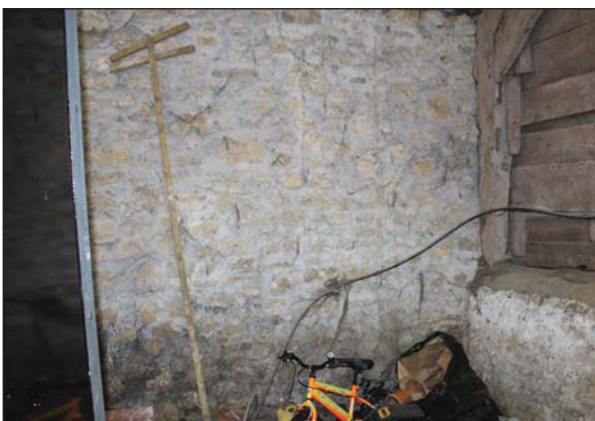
South corner of barn. Stone wall, cornered with lower stone wall, and wooden planks. Looking South.
